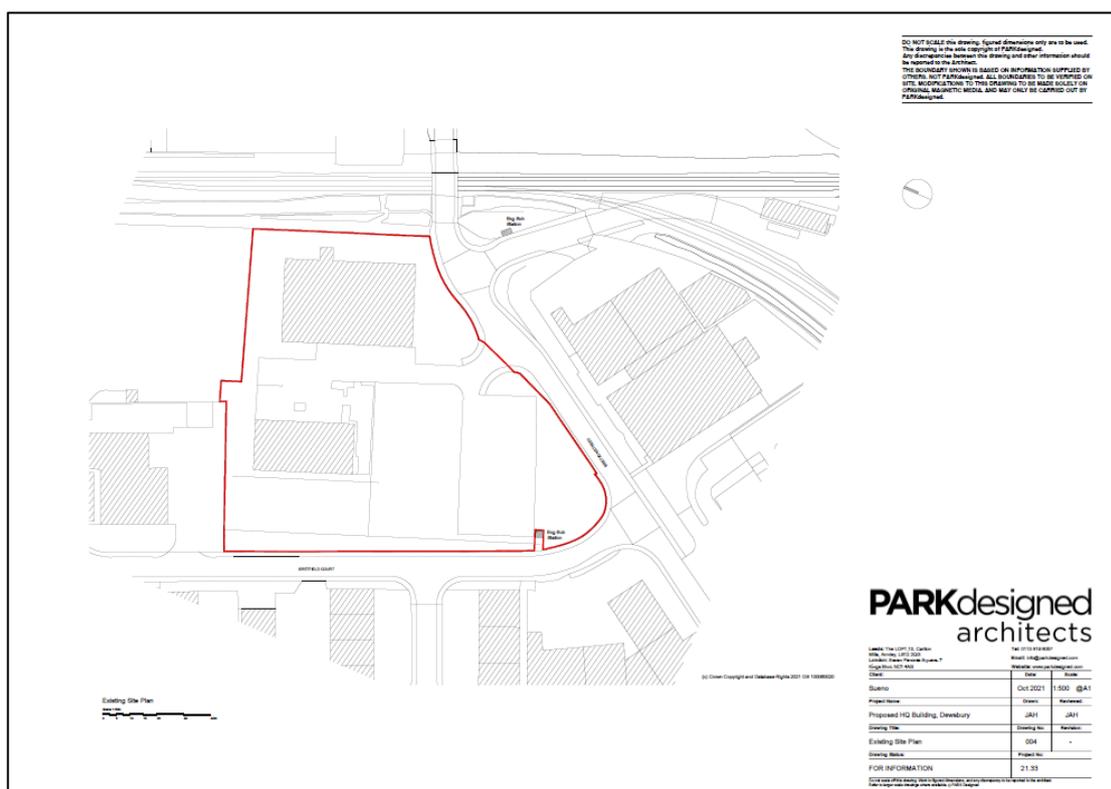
Site plan as existing with red line showing area subject to planning permission.
